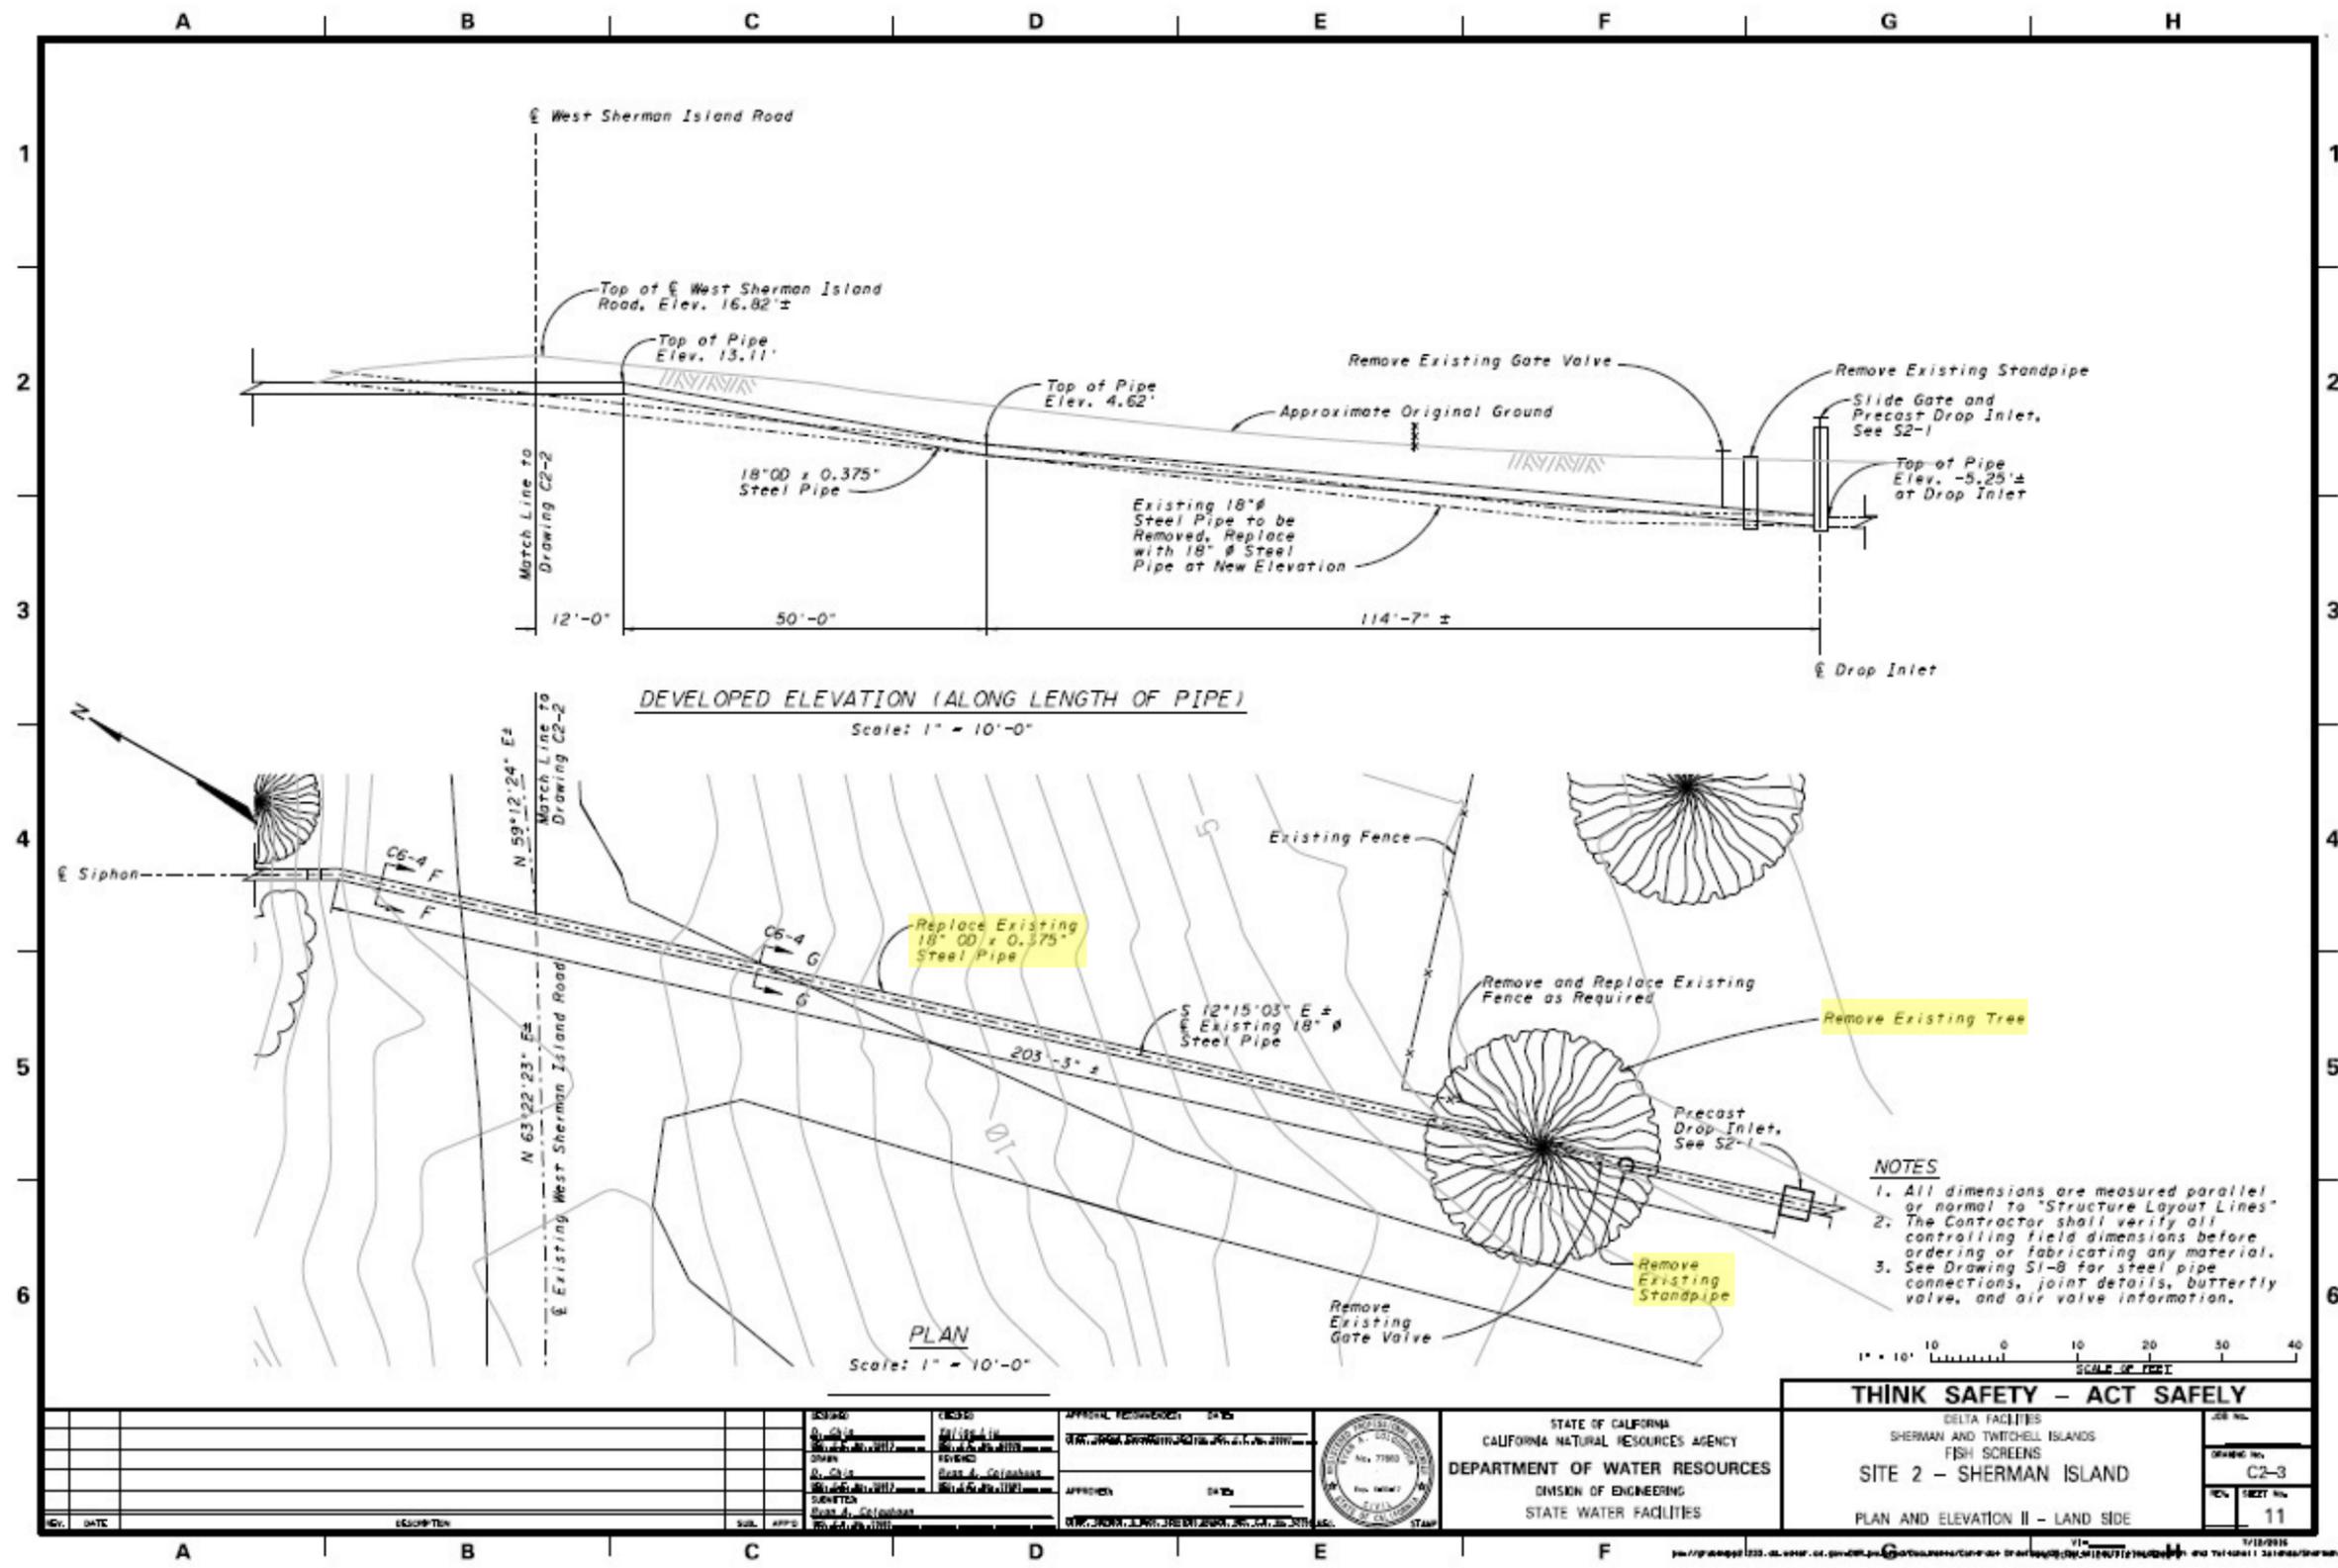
Site 2 - Pipe and Tree Removal Plans and Specifications
